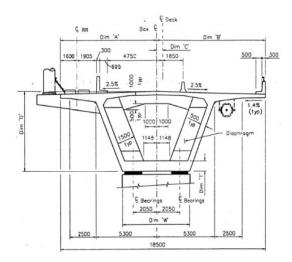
Typical deck section at pier (Source: Contract drawing of Jamuna Multipurpose Bridge Authority)
